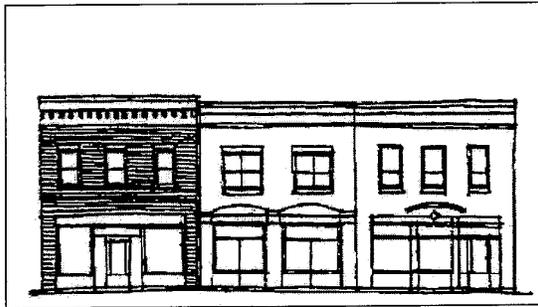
Upper stories of commercial structures should appear more solid than the transparent glass storefronts found at the street level.
